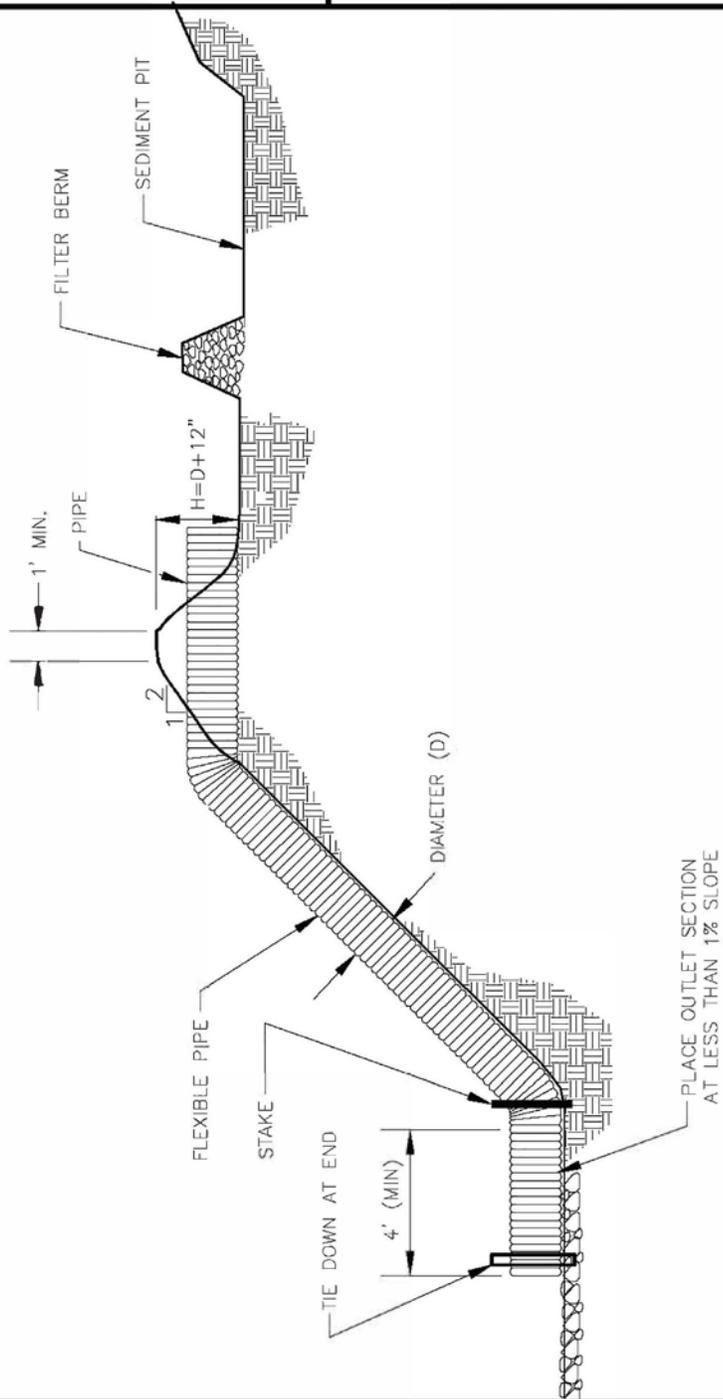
FLEXIBLE PIPE SLOPE DRAIN
